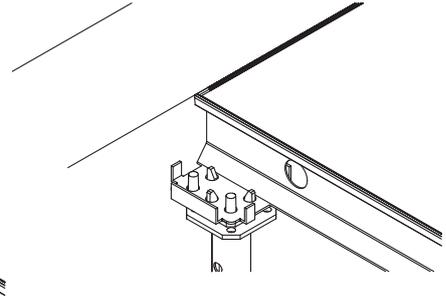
Prop - shoring head with the head cover located at the building wall
